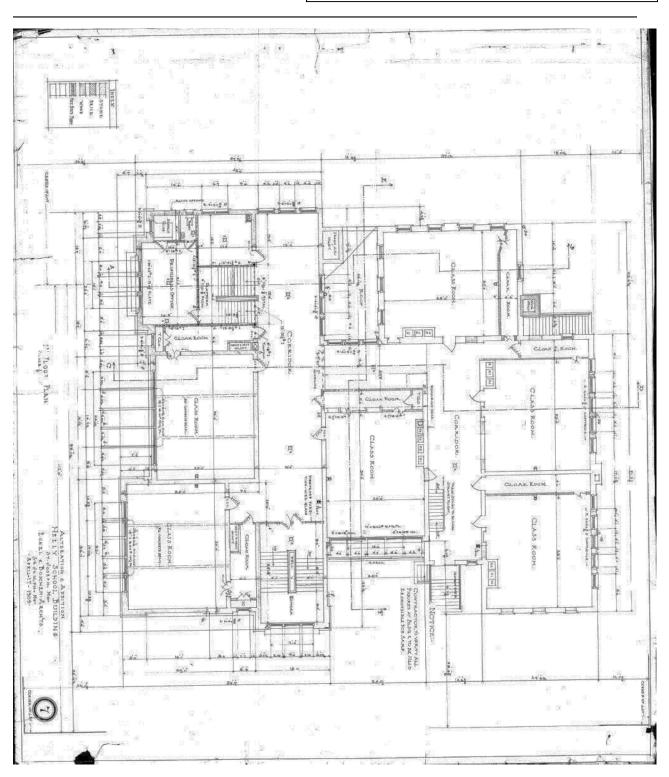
Eckel and Boschen Architects, First Floor Plan, April 1909 (Architects 1909)
